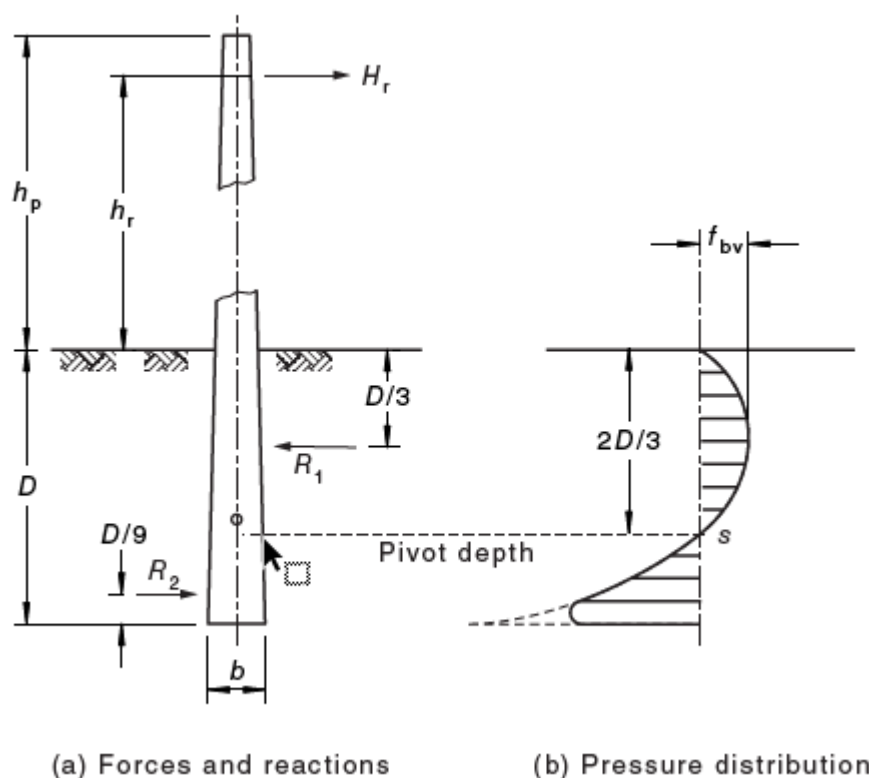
FORCES ON FOOTINGS AND DIRECT EMBEDMENT FOUNDATION, AN EXTRACT FROM THE SA/SNZ HB331 FIGURE 10.3
